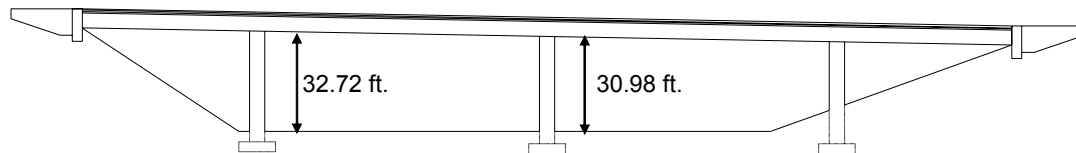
Elevation View of Voigt Drive / I-5 Overcrossing
